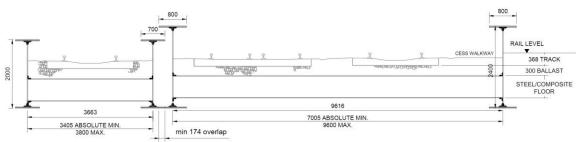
Cross section illustrating a SDD deck arrangement without track alignment
